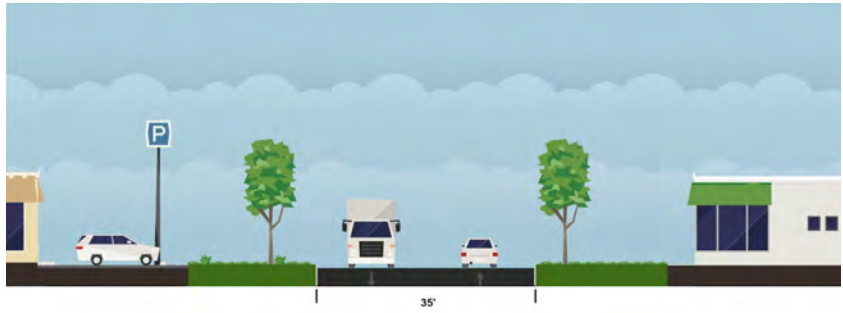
(b) - Proposed Cross-section: University Drive Bike Lane Concept
